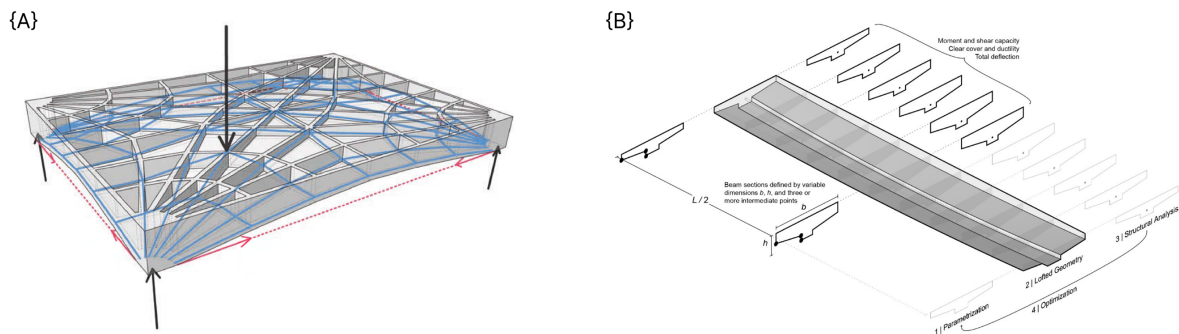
(a) BRG HiLo floor system [11]; (b) Shaped ribbed slab floor system [12]
